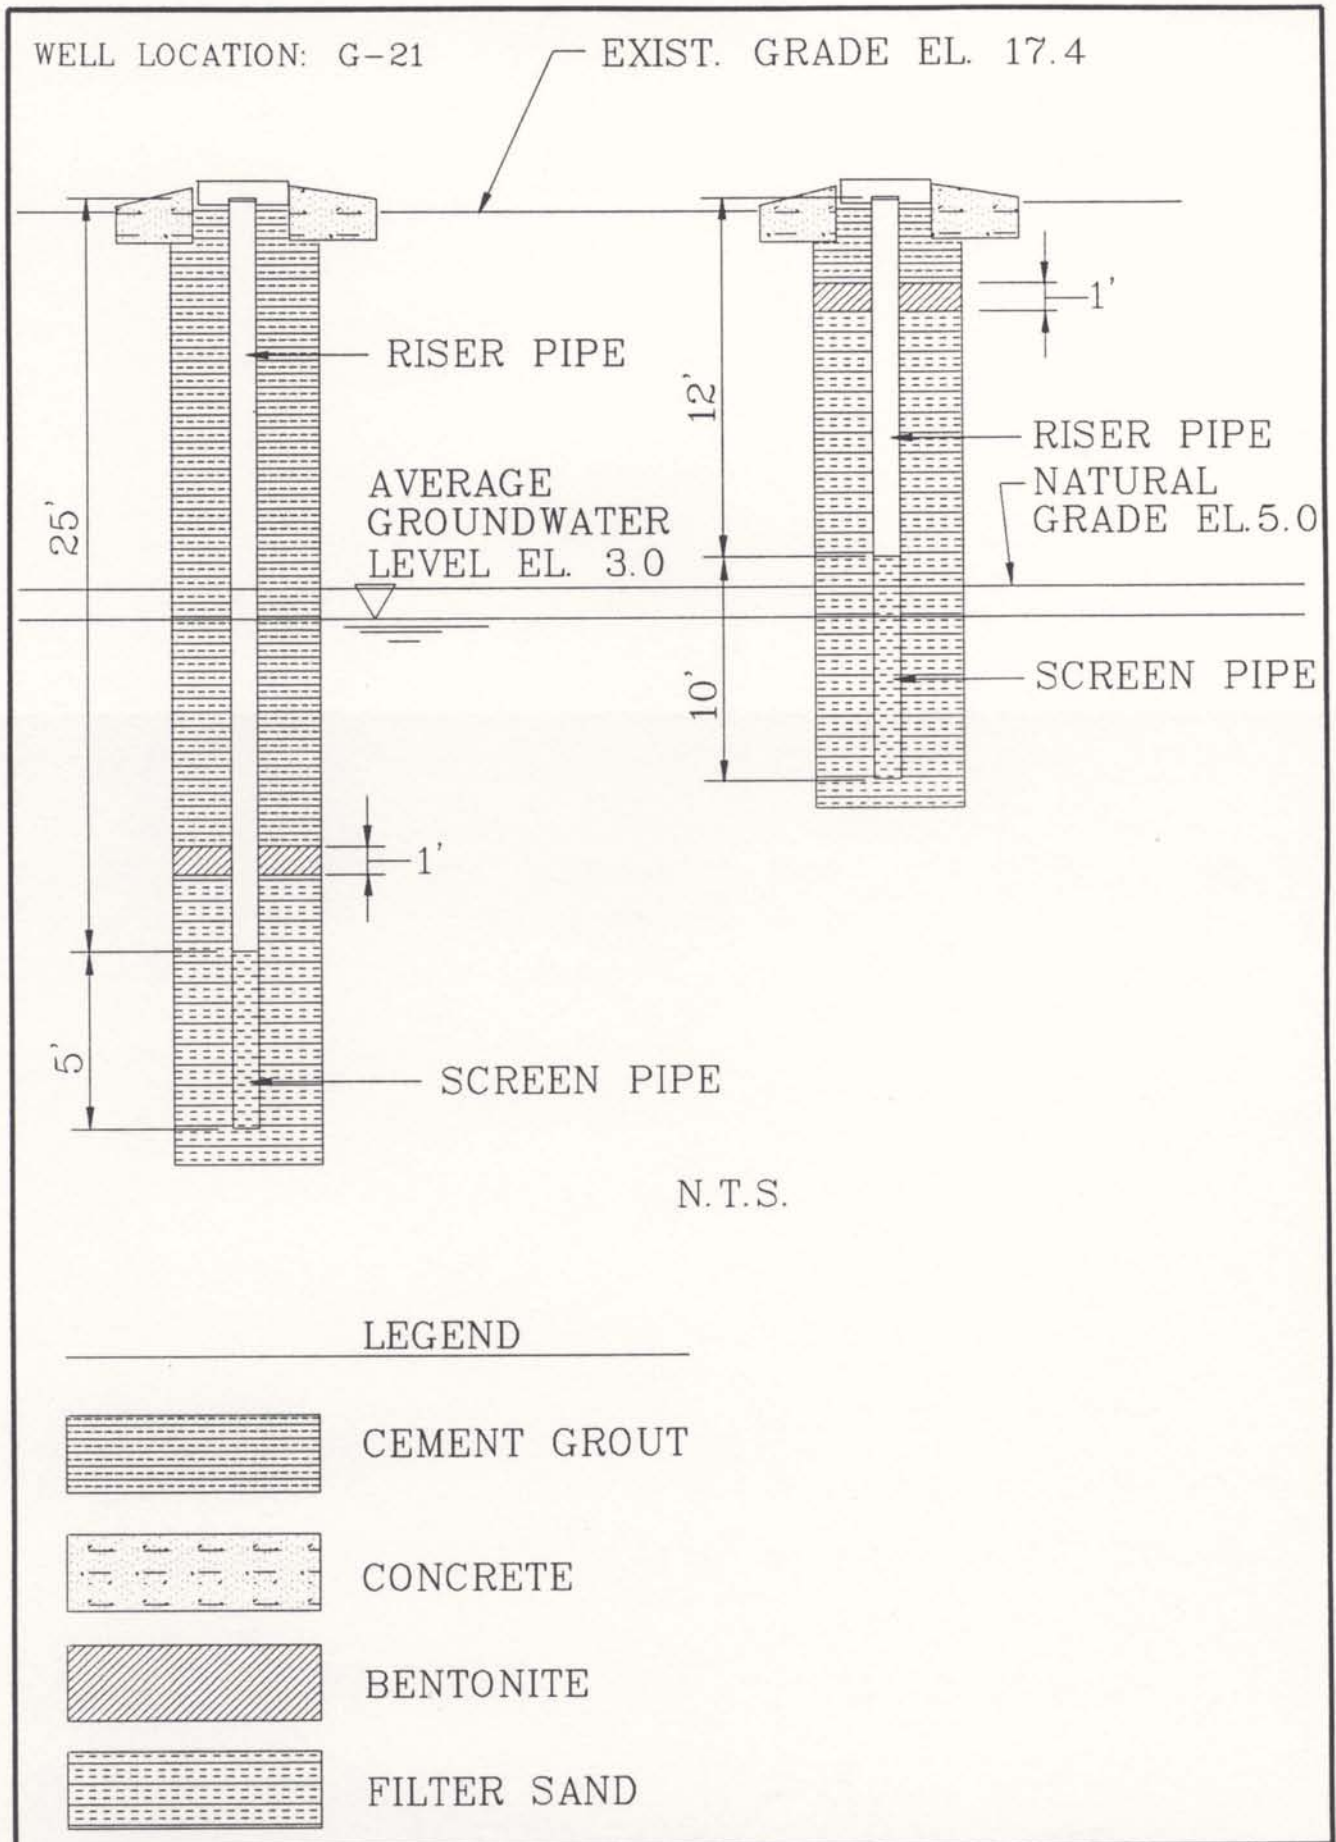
Typical Leachate And Shallow Groundwater Well Construction Details
